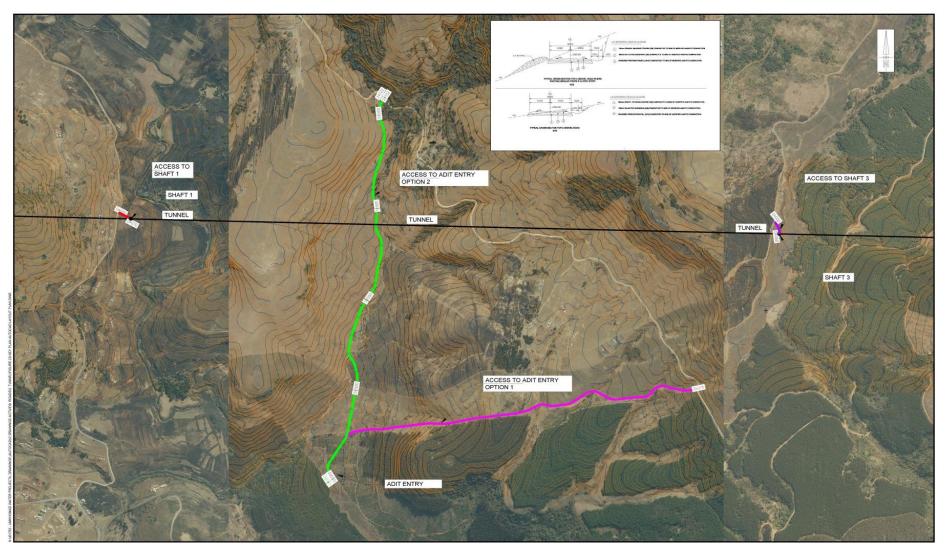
Transfer tunnel – Layout of access roads to shaft 1, adit entry and shaft 3
